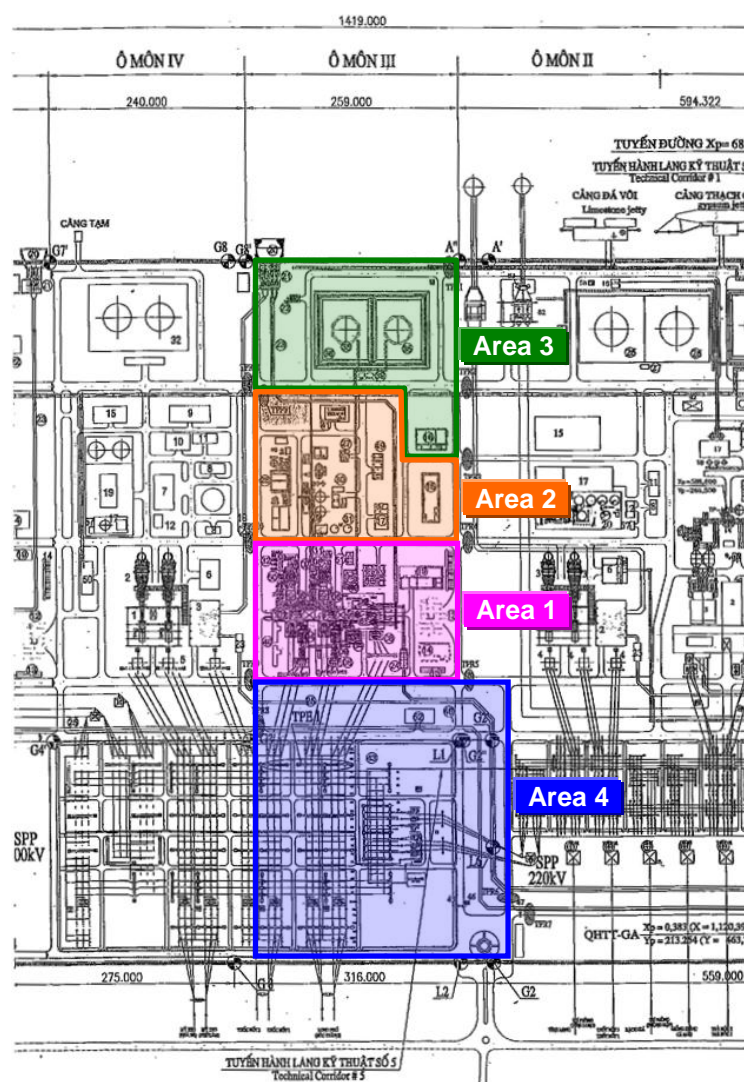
Arrangement of Area 1 ~ Area 4 for O Mon 3 Power Plant
